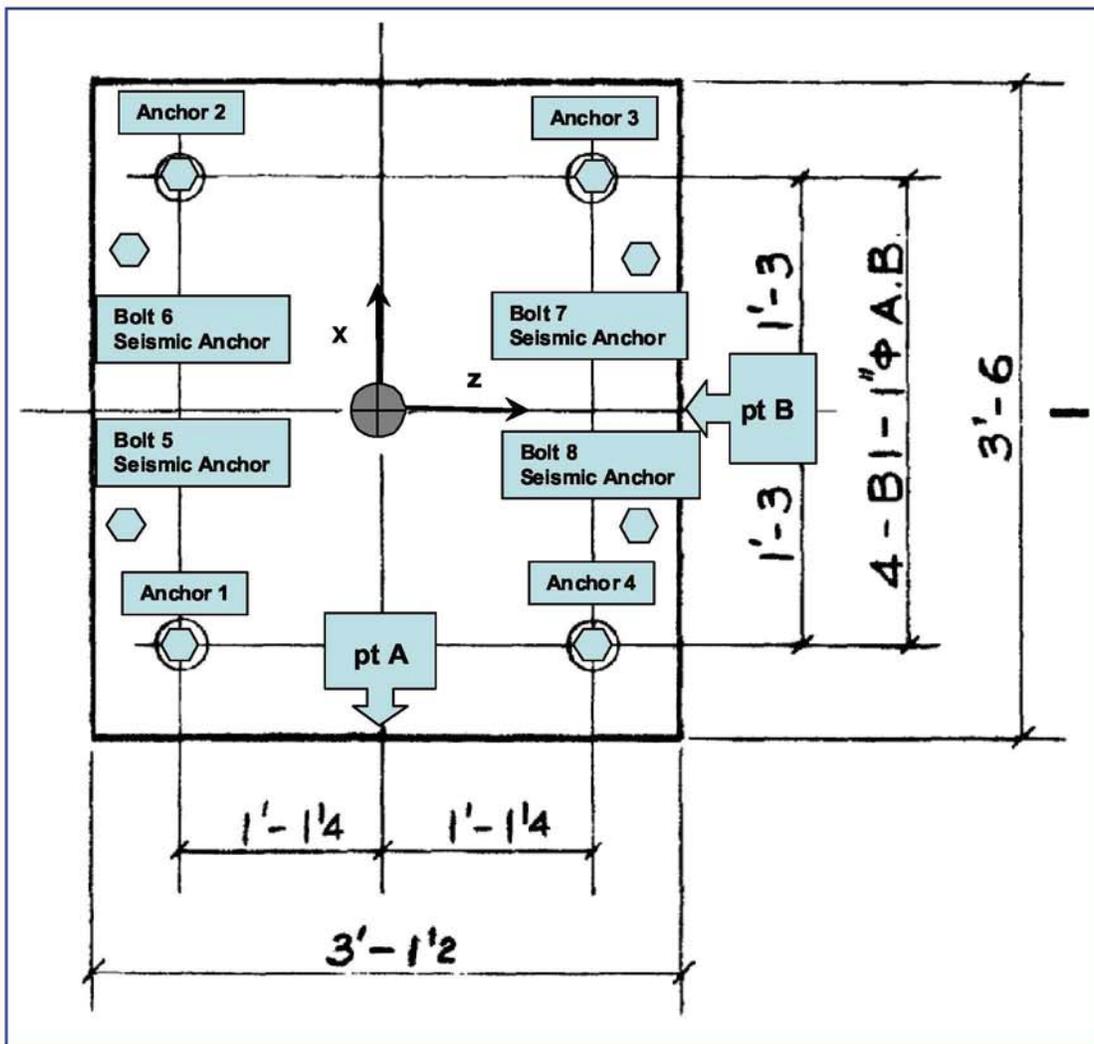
Location of concrete embedded anchors and seismic anchors
